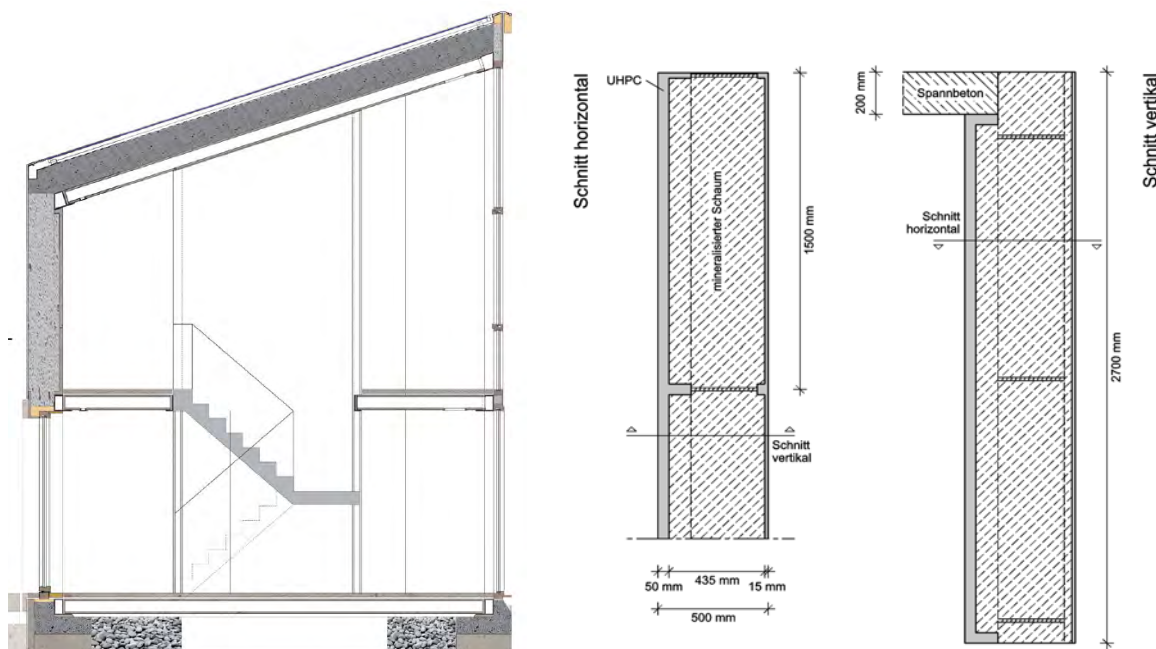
Vertical building section and vertical and horizontal section of the proposed wall system
